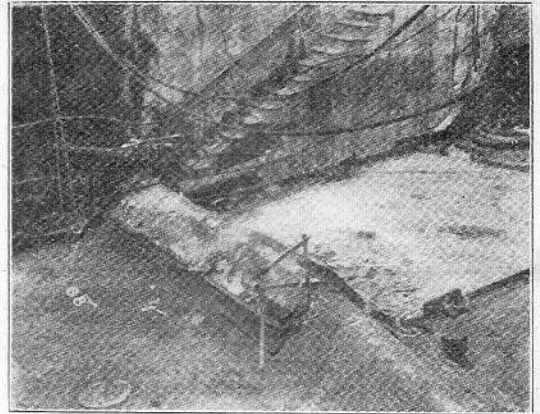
Sagging Test. Details of Buckling of Port Deck Stringer Plate, Frames 86-88.
